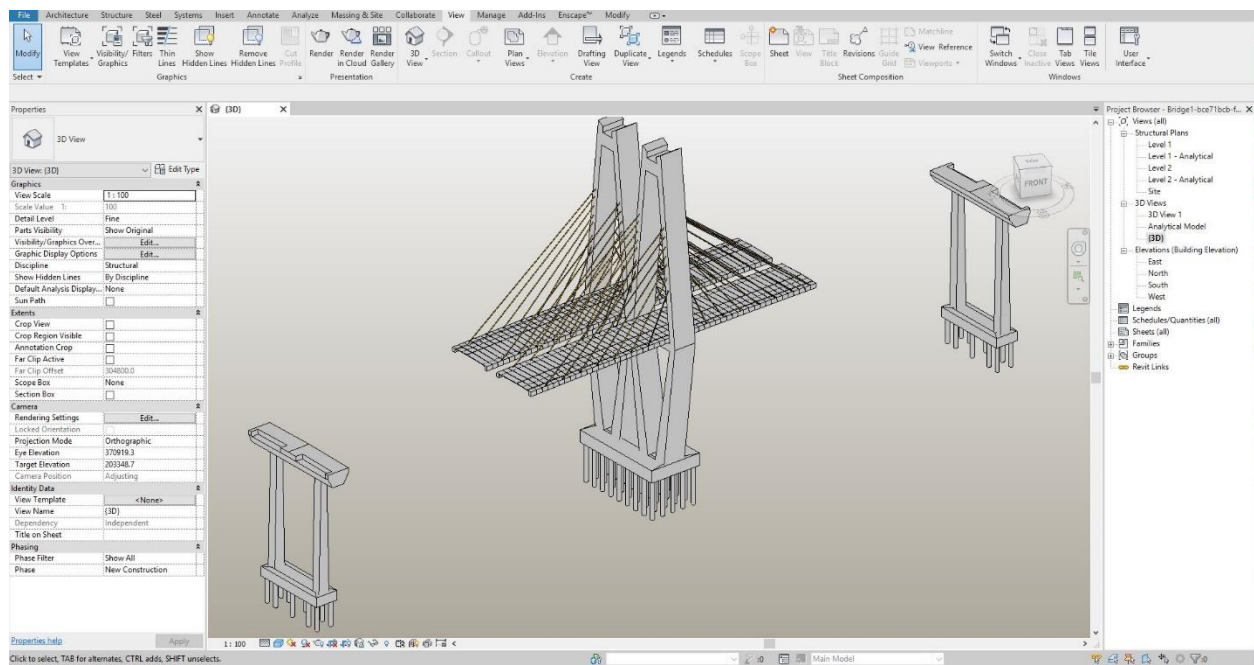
Design Visualization Model showing Parametric Cable Stayed Bridge in Revit 2020
